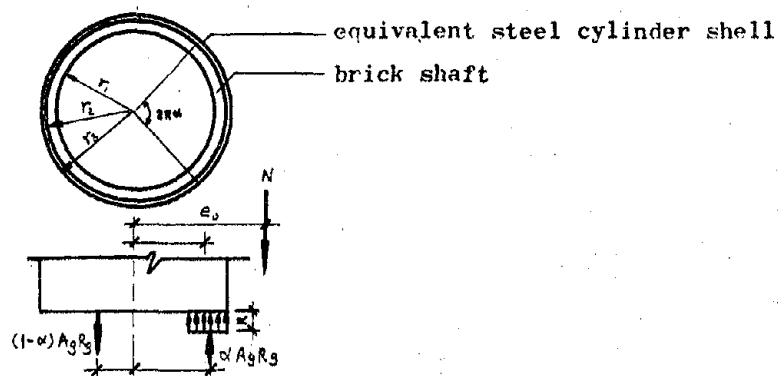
Schematic diagram for checking the strength of a cross section of strengthened chimney
